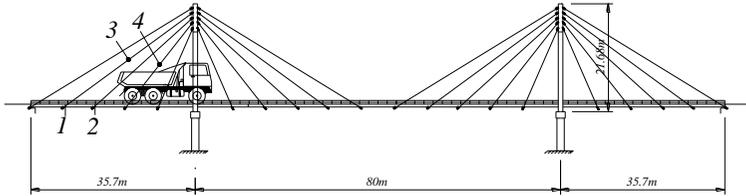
Installation of the measuring equipment on the Pho Nam bridge
